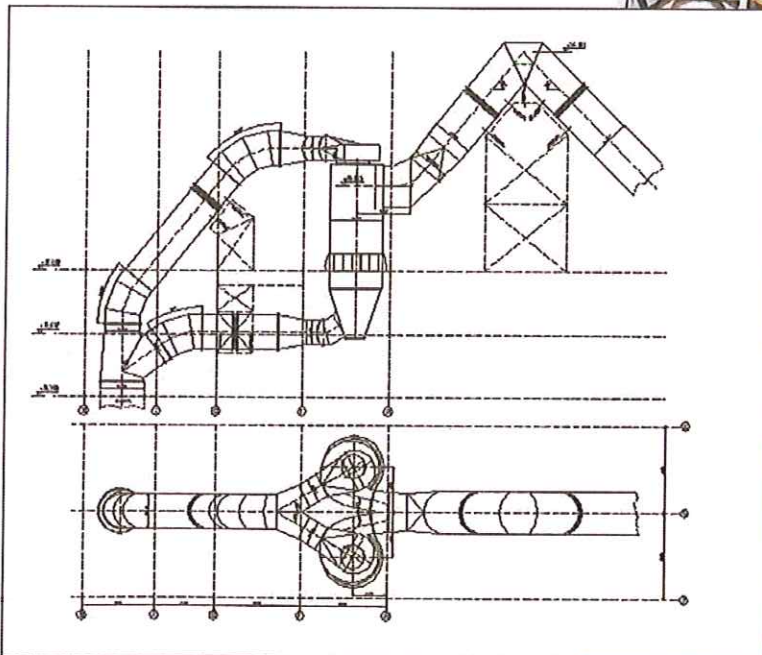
Sketch of HURRICLON® installation in raw mill circuit
